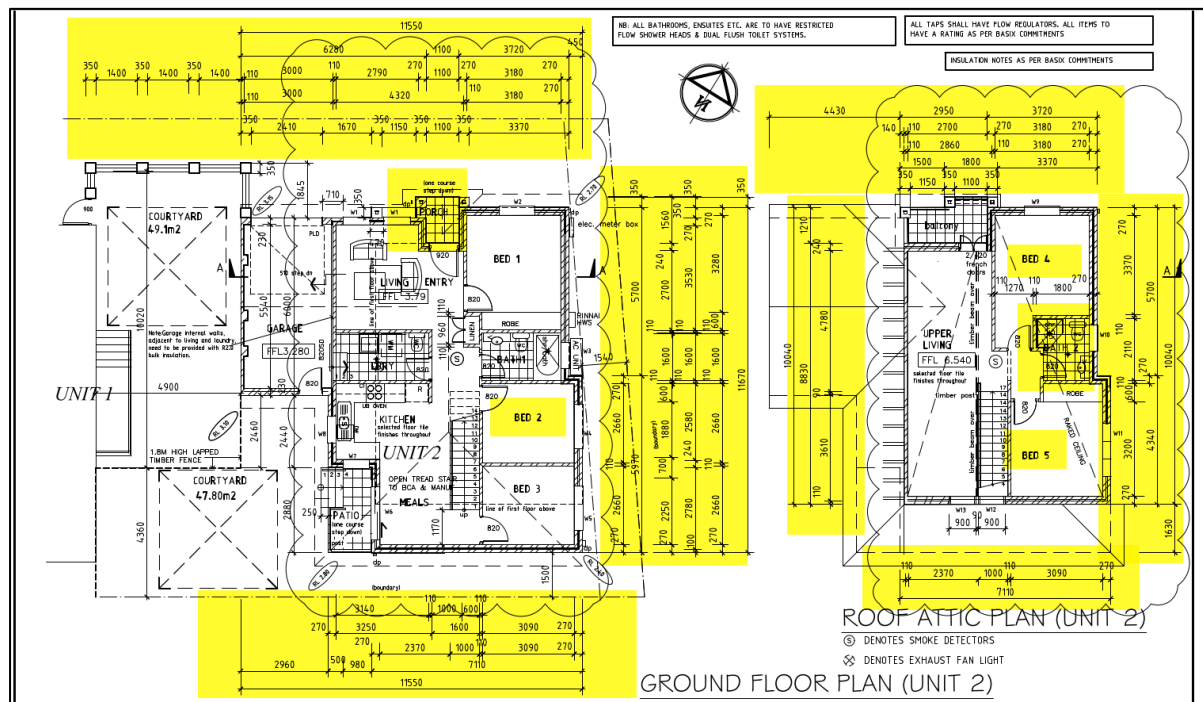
Proposed unit 2 floor plans (changes highlighted in yellow)
